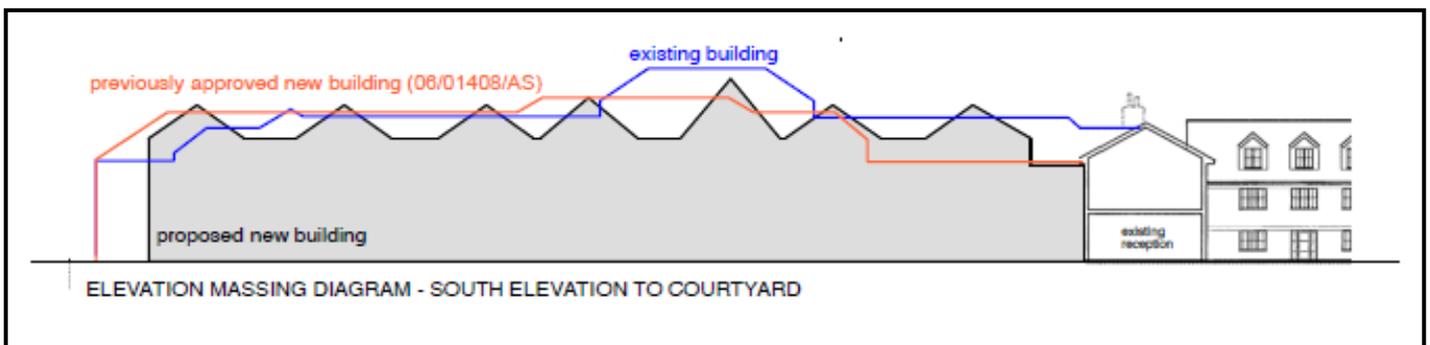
Elevation Massing Diagram showing existing, previously approved and proposed buildings
